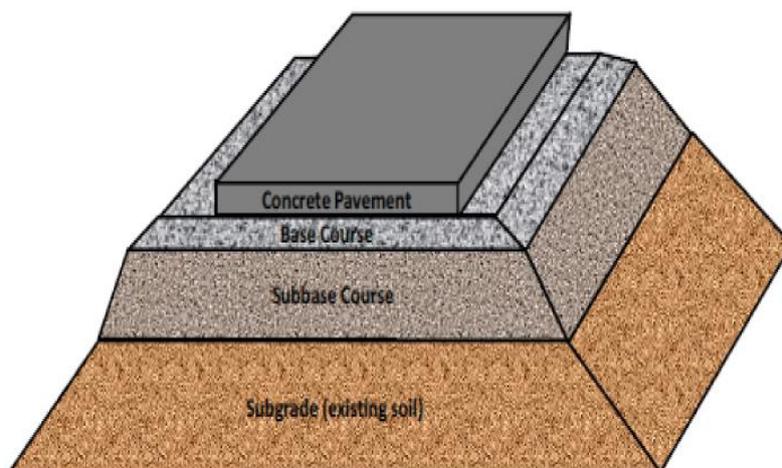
Typical cross-section of a pavement structure and terminology of the different layers
